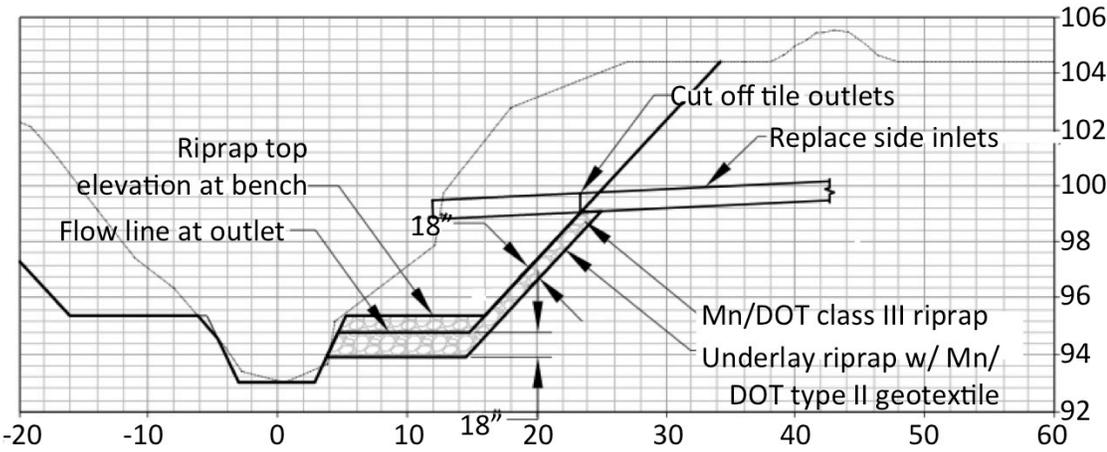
Schematic Showing the Construction Modifications to Each Tile Outlet. Dimensions are in Feet and Inches. Drawing by Joel Peterson.
